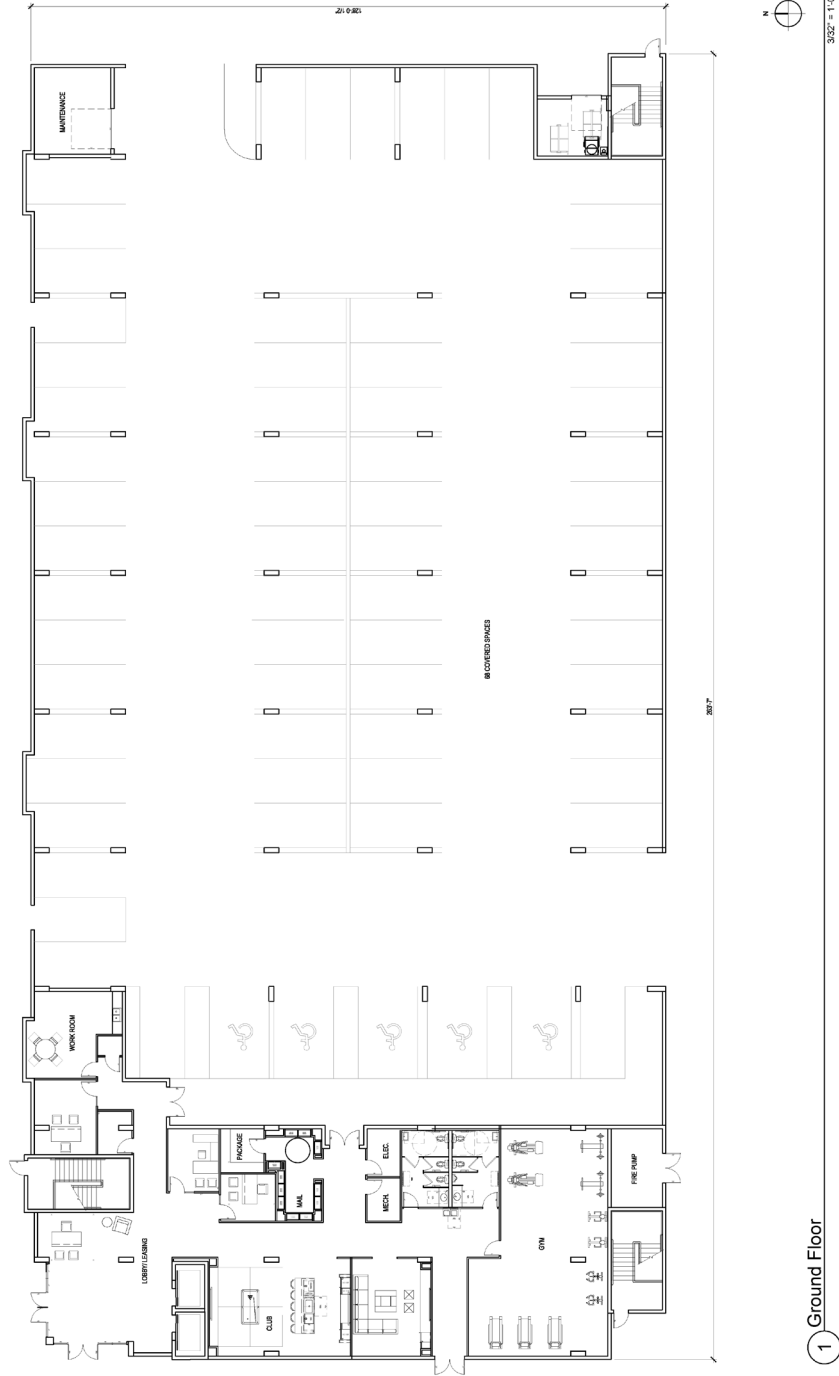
Conceptual Floor Plan Sheet 2 of 3 dated August 3, 2020
